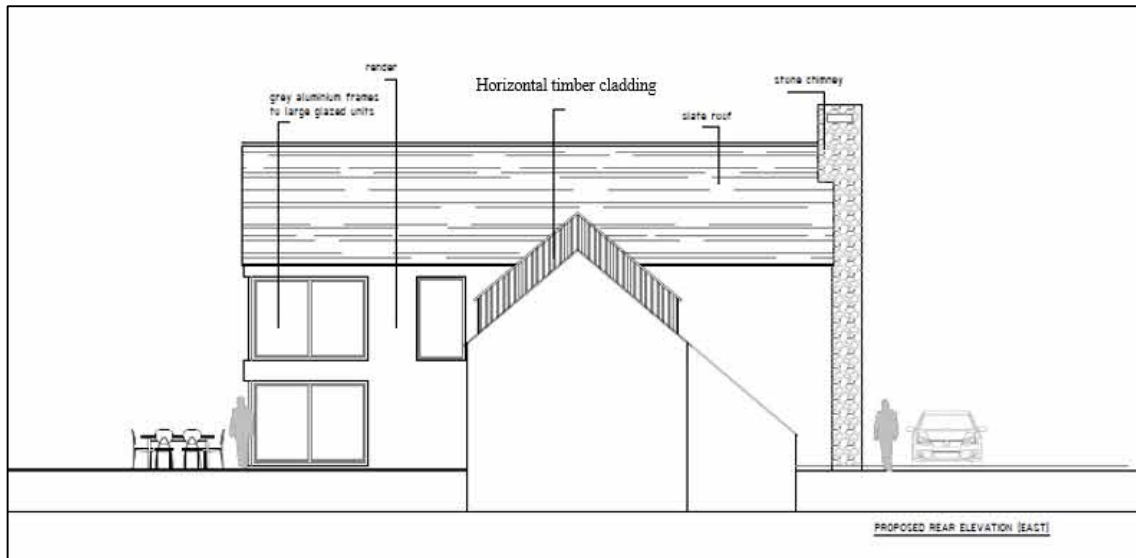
Proposed south-eastern elevation of new dwelling and retained barn
